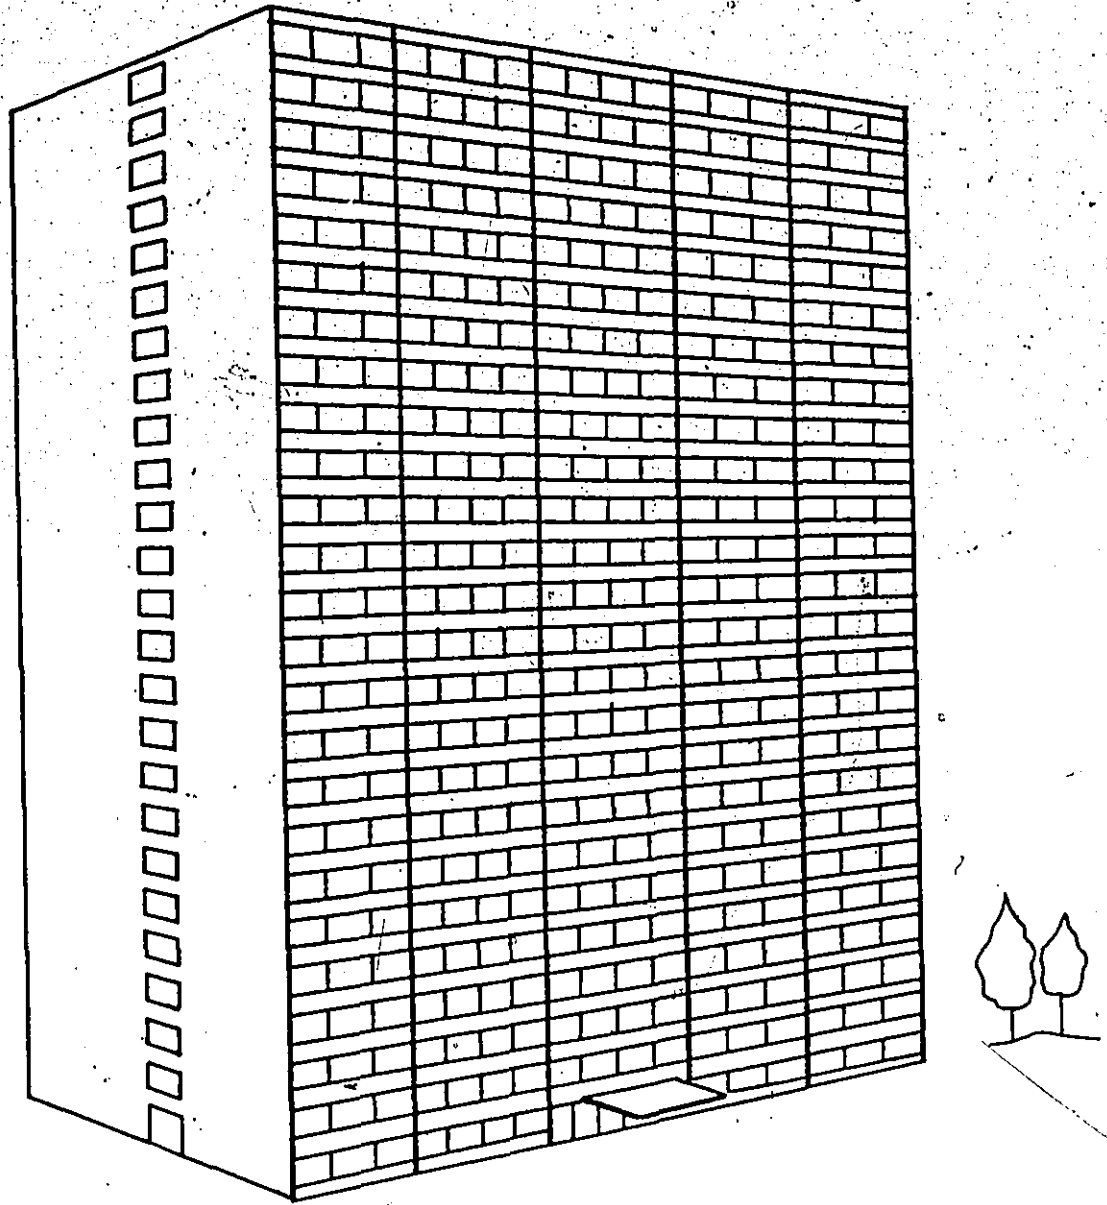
A TYPICAL APARTMENT BUILDING
